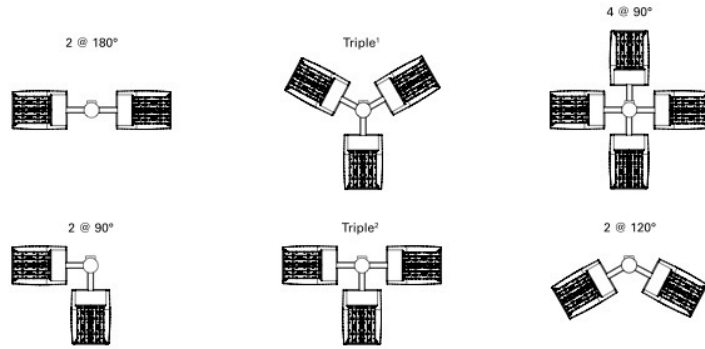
PARKING LIGHT FIXTURE DETAILS
